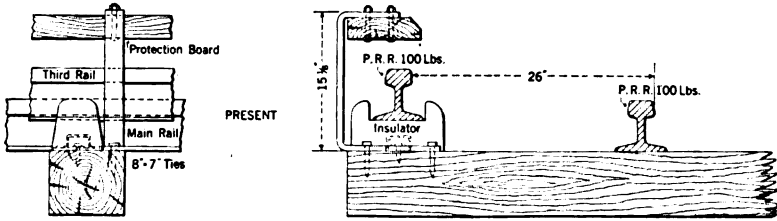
GENERAL ARRANGEMENT OF PROTECTION ADDED IN 1912
